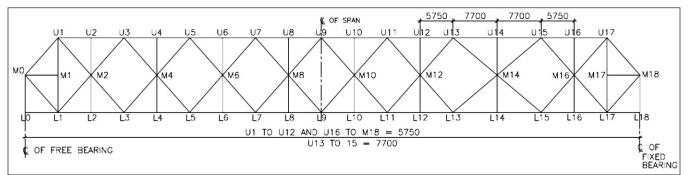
Revised span configuration of the anchor span fabricated during cantilever launching
